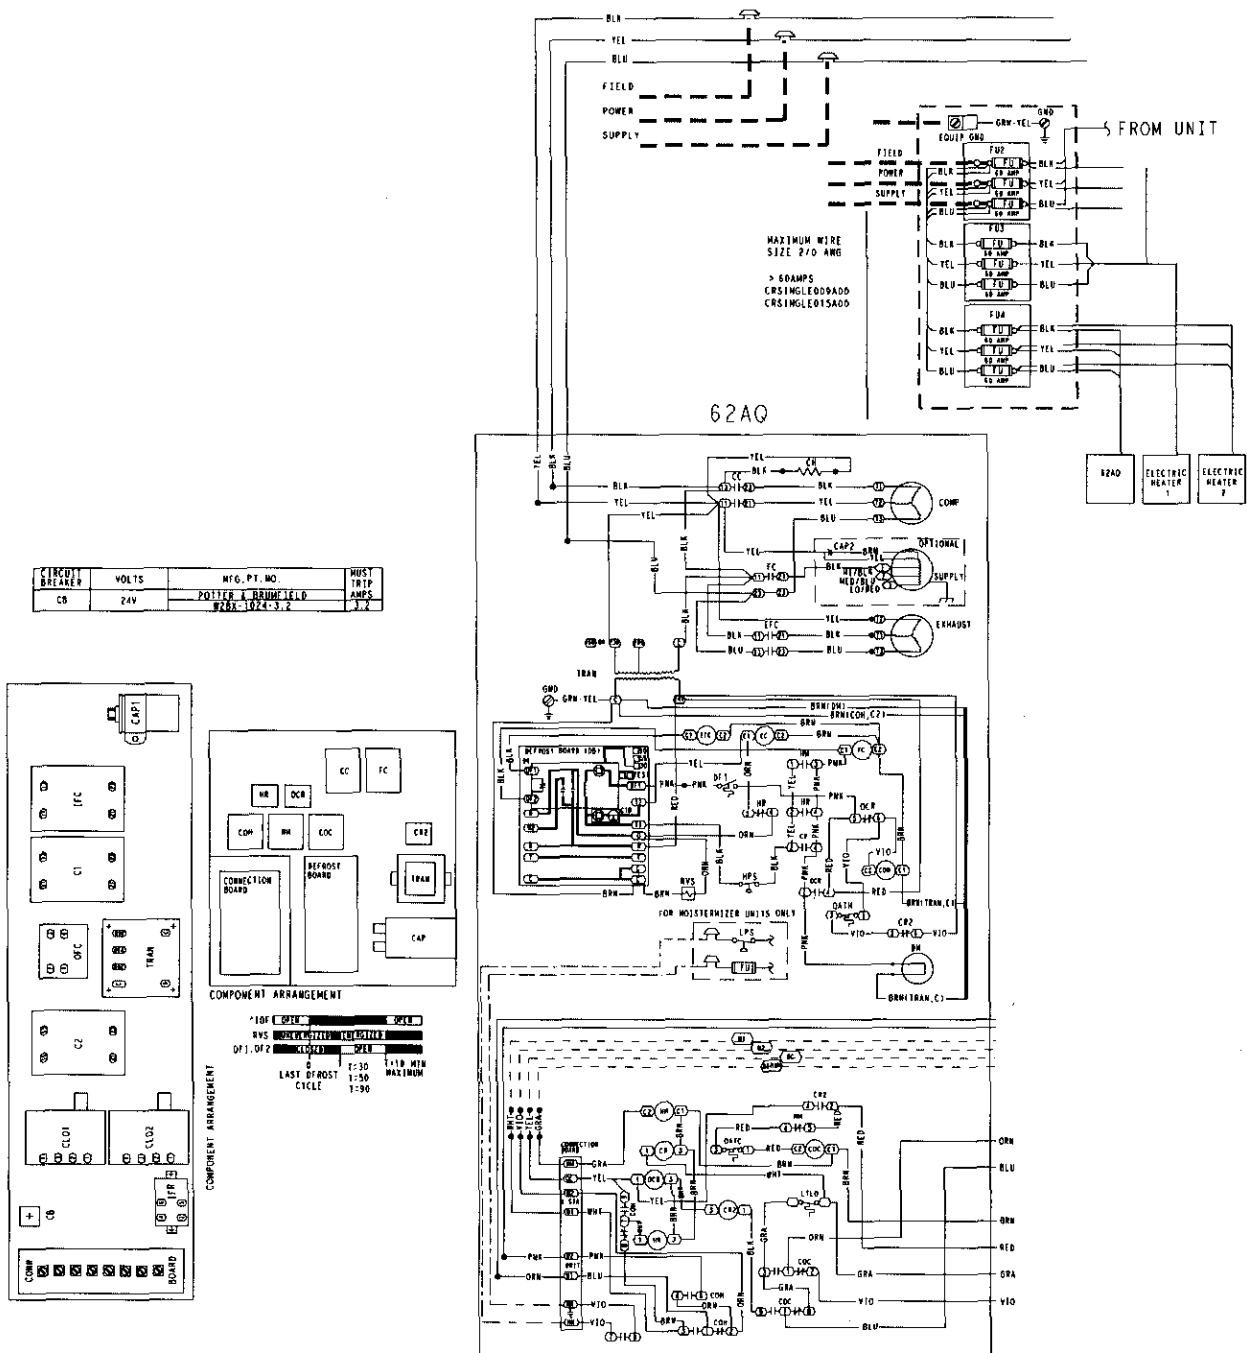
COBRA™ Unit Wiring Schematic (50HJ008/009 with 62AQ300, 208/230-3-60) with Electro-Mechanical Controls
